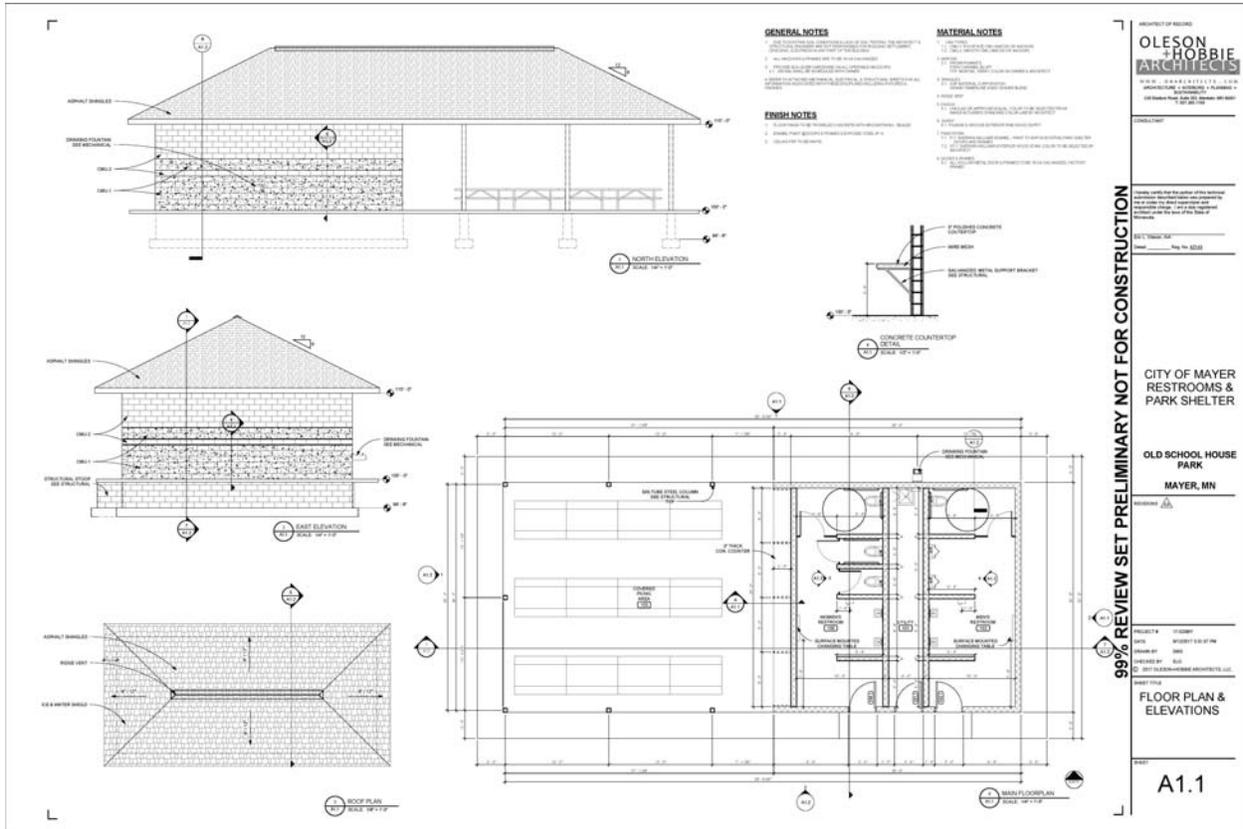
Exhibit F - Building Elevations & Floor plan dated September 8, 2017
